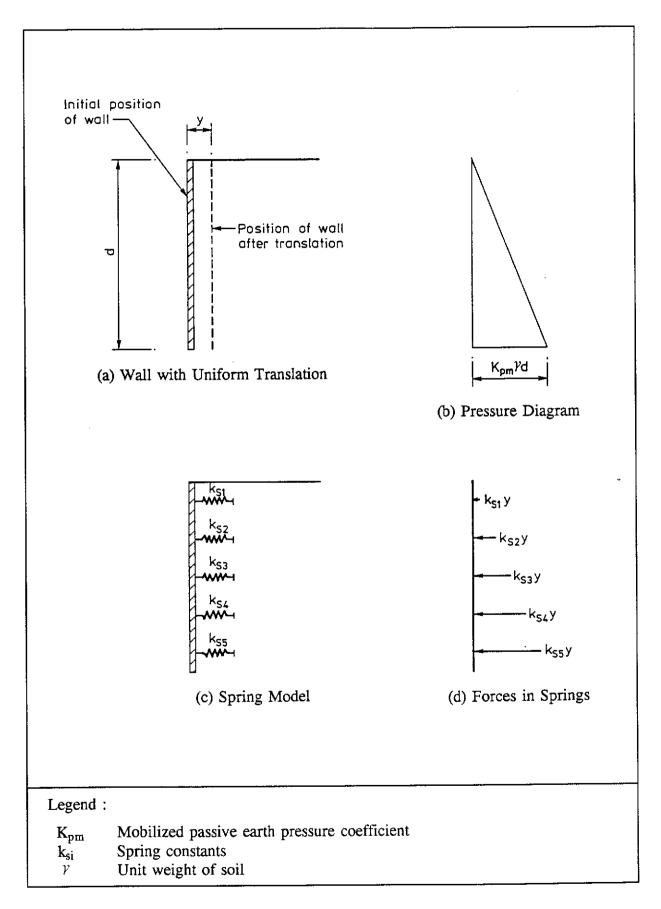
Spring Model and Forces Acting on a Wall Translating into a Soil Mass
